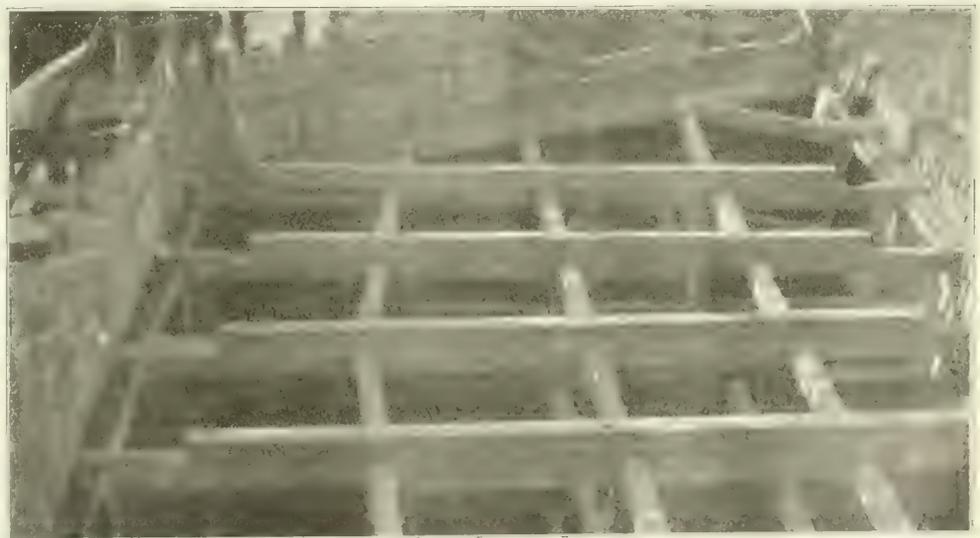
View of Top of Cofferdam for Arch Abutment of San Jacinto St. Bridge. Note Heavy Bracing and 8x10-in. Timber Sheeting.
